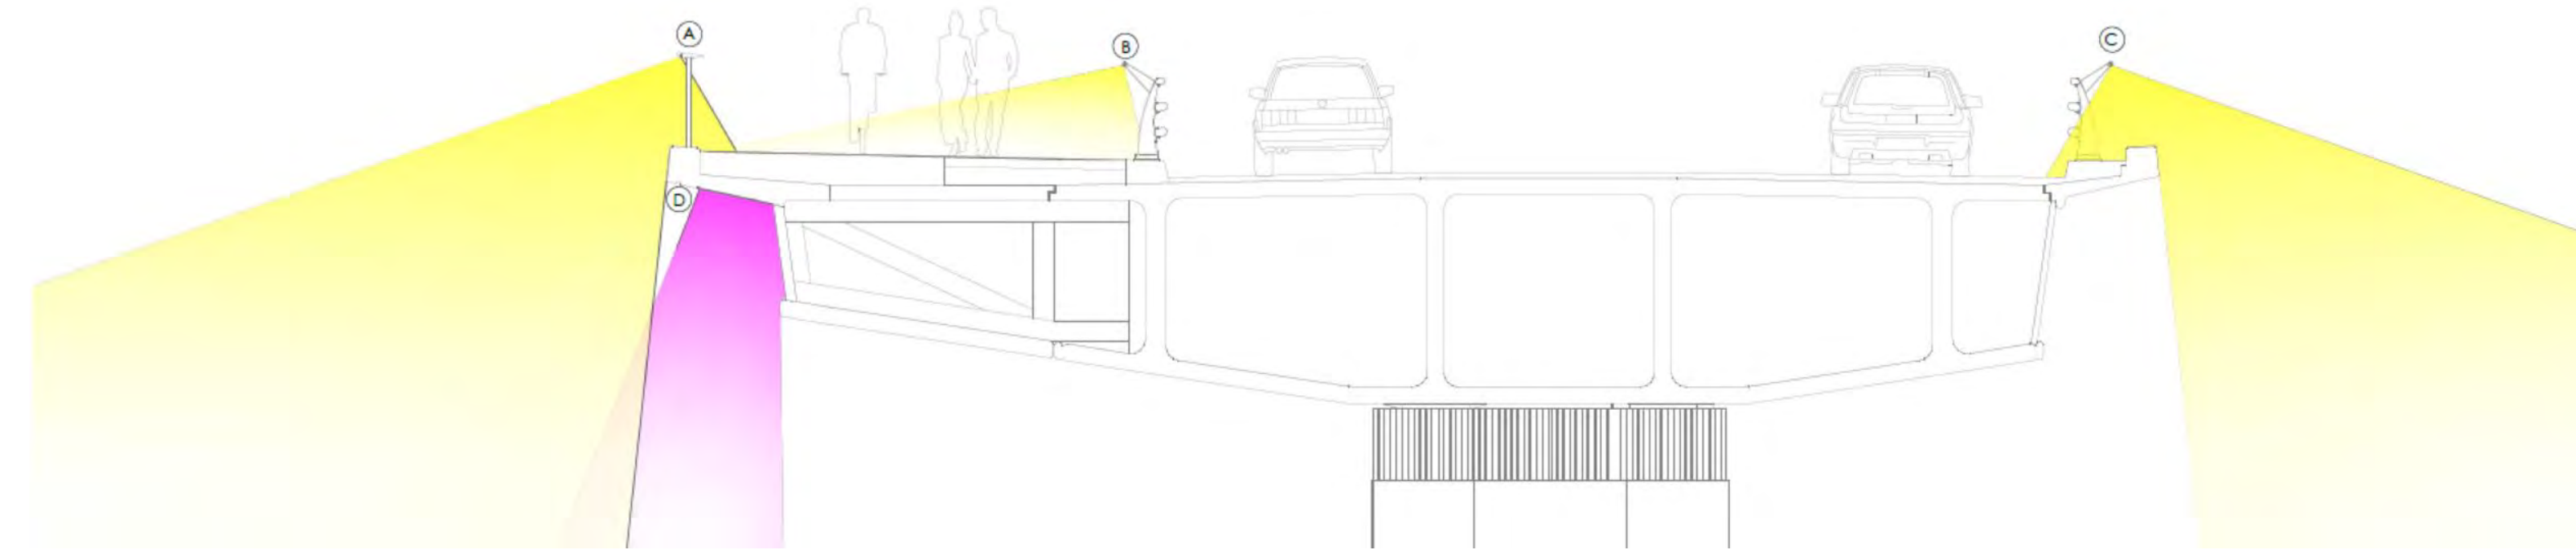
Detail of integral handrail lighting of the Commonwealth Avenue Bridge. (Source: K Baker, 2020)
